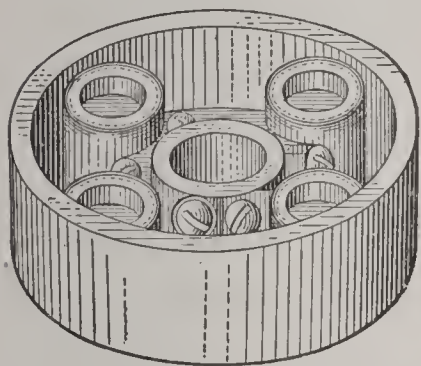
Outlet Box for Armored Cable and Flexible Conduit.
